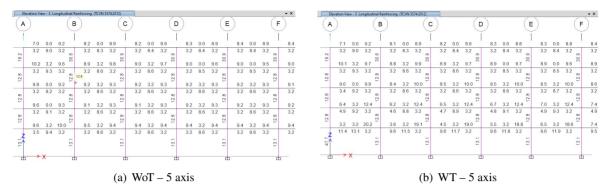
Design reinforcement (cm²) for beams and columns of model S3
